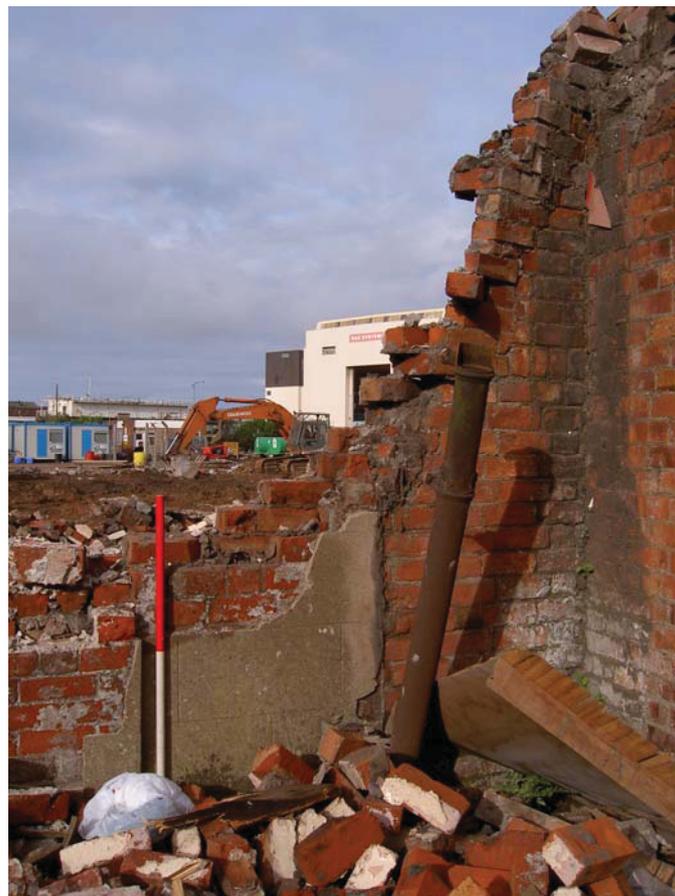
Blocked opening between foundry Buildings 5 and 6 revealed during demolition
